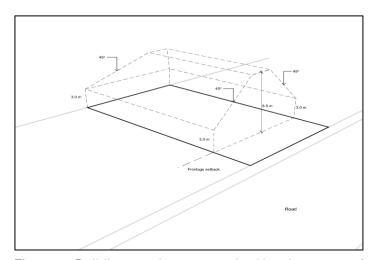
Building envelope as required by clause 8.4.2 A3(a)
